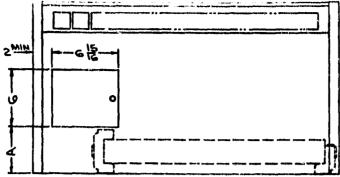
DETAIL OF DAMPER MOUNTING — ALL UNITS (TYPE W SHOWN) DAMPER
